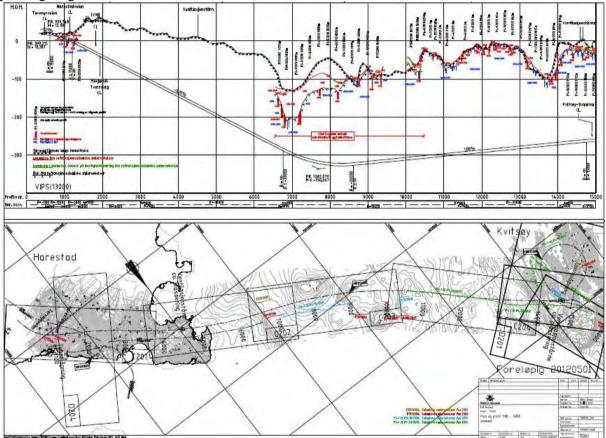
The tunnel alignment from Randaberg to Kvitsøy.
